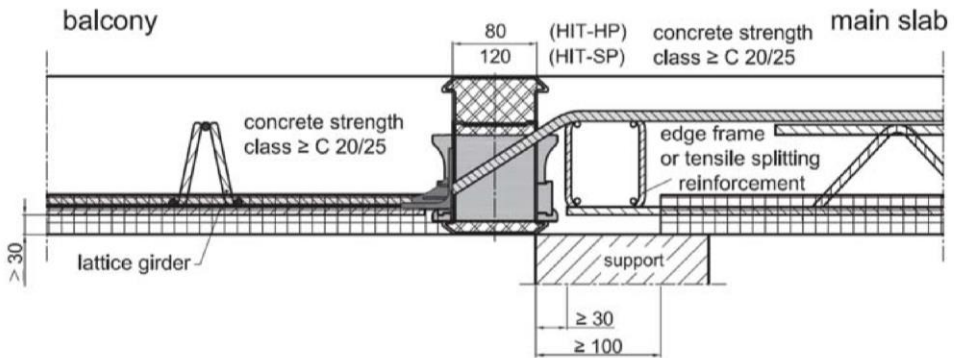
Example of the connection HIT-HP/SP ZVX to element slabs with statically effective in-situ layer
